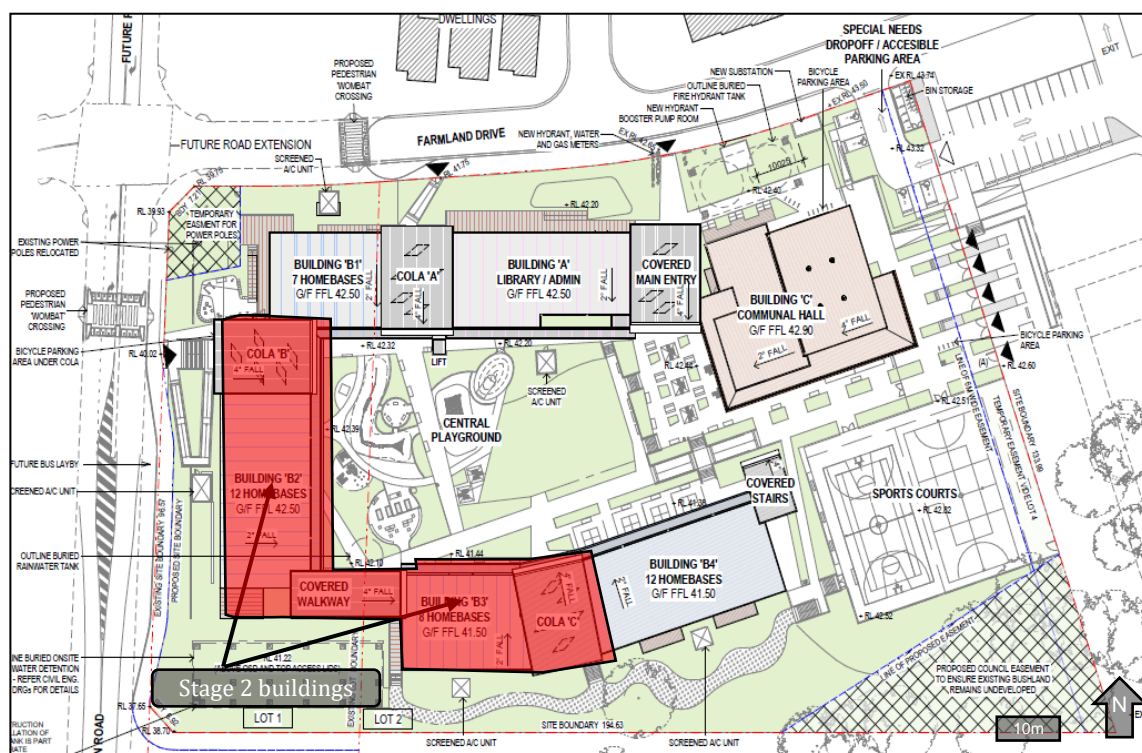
| Approved site layout with Stage 2 buildings shown in red (Source: Department's SSD-9368 Assessment Report 2020)
